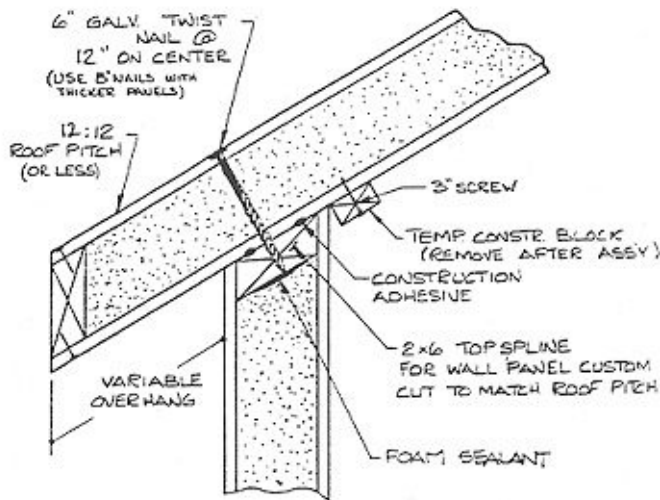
Wall-Roof Intersection with Shallow Roofs: If a roof with a large overhang or roof pitch less than 12:12 is needed, the wall panels are cut at the roof angle, routed-out and fitted with custom-cut top splines. Roof panels are then secured with adhesive and long twist nails.
